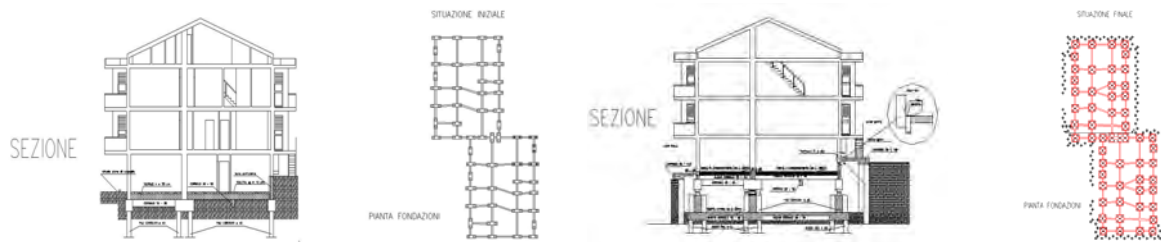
Vertical and horizontal sections of the original and the retrofitted dwelling house in Fabriano (from left to right).
